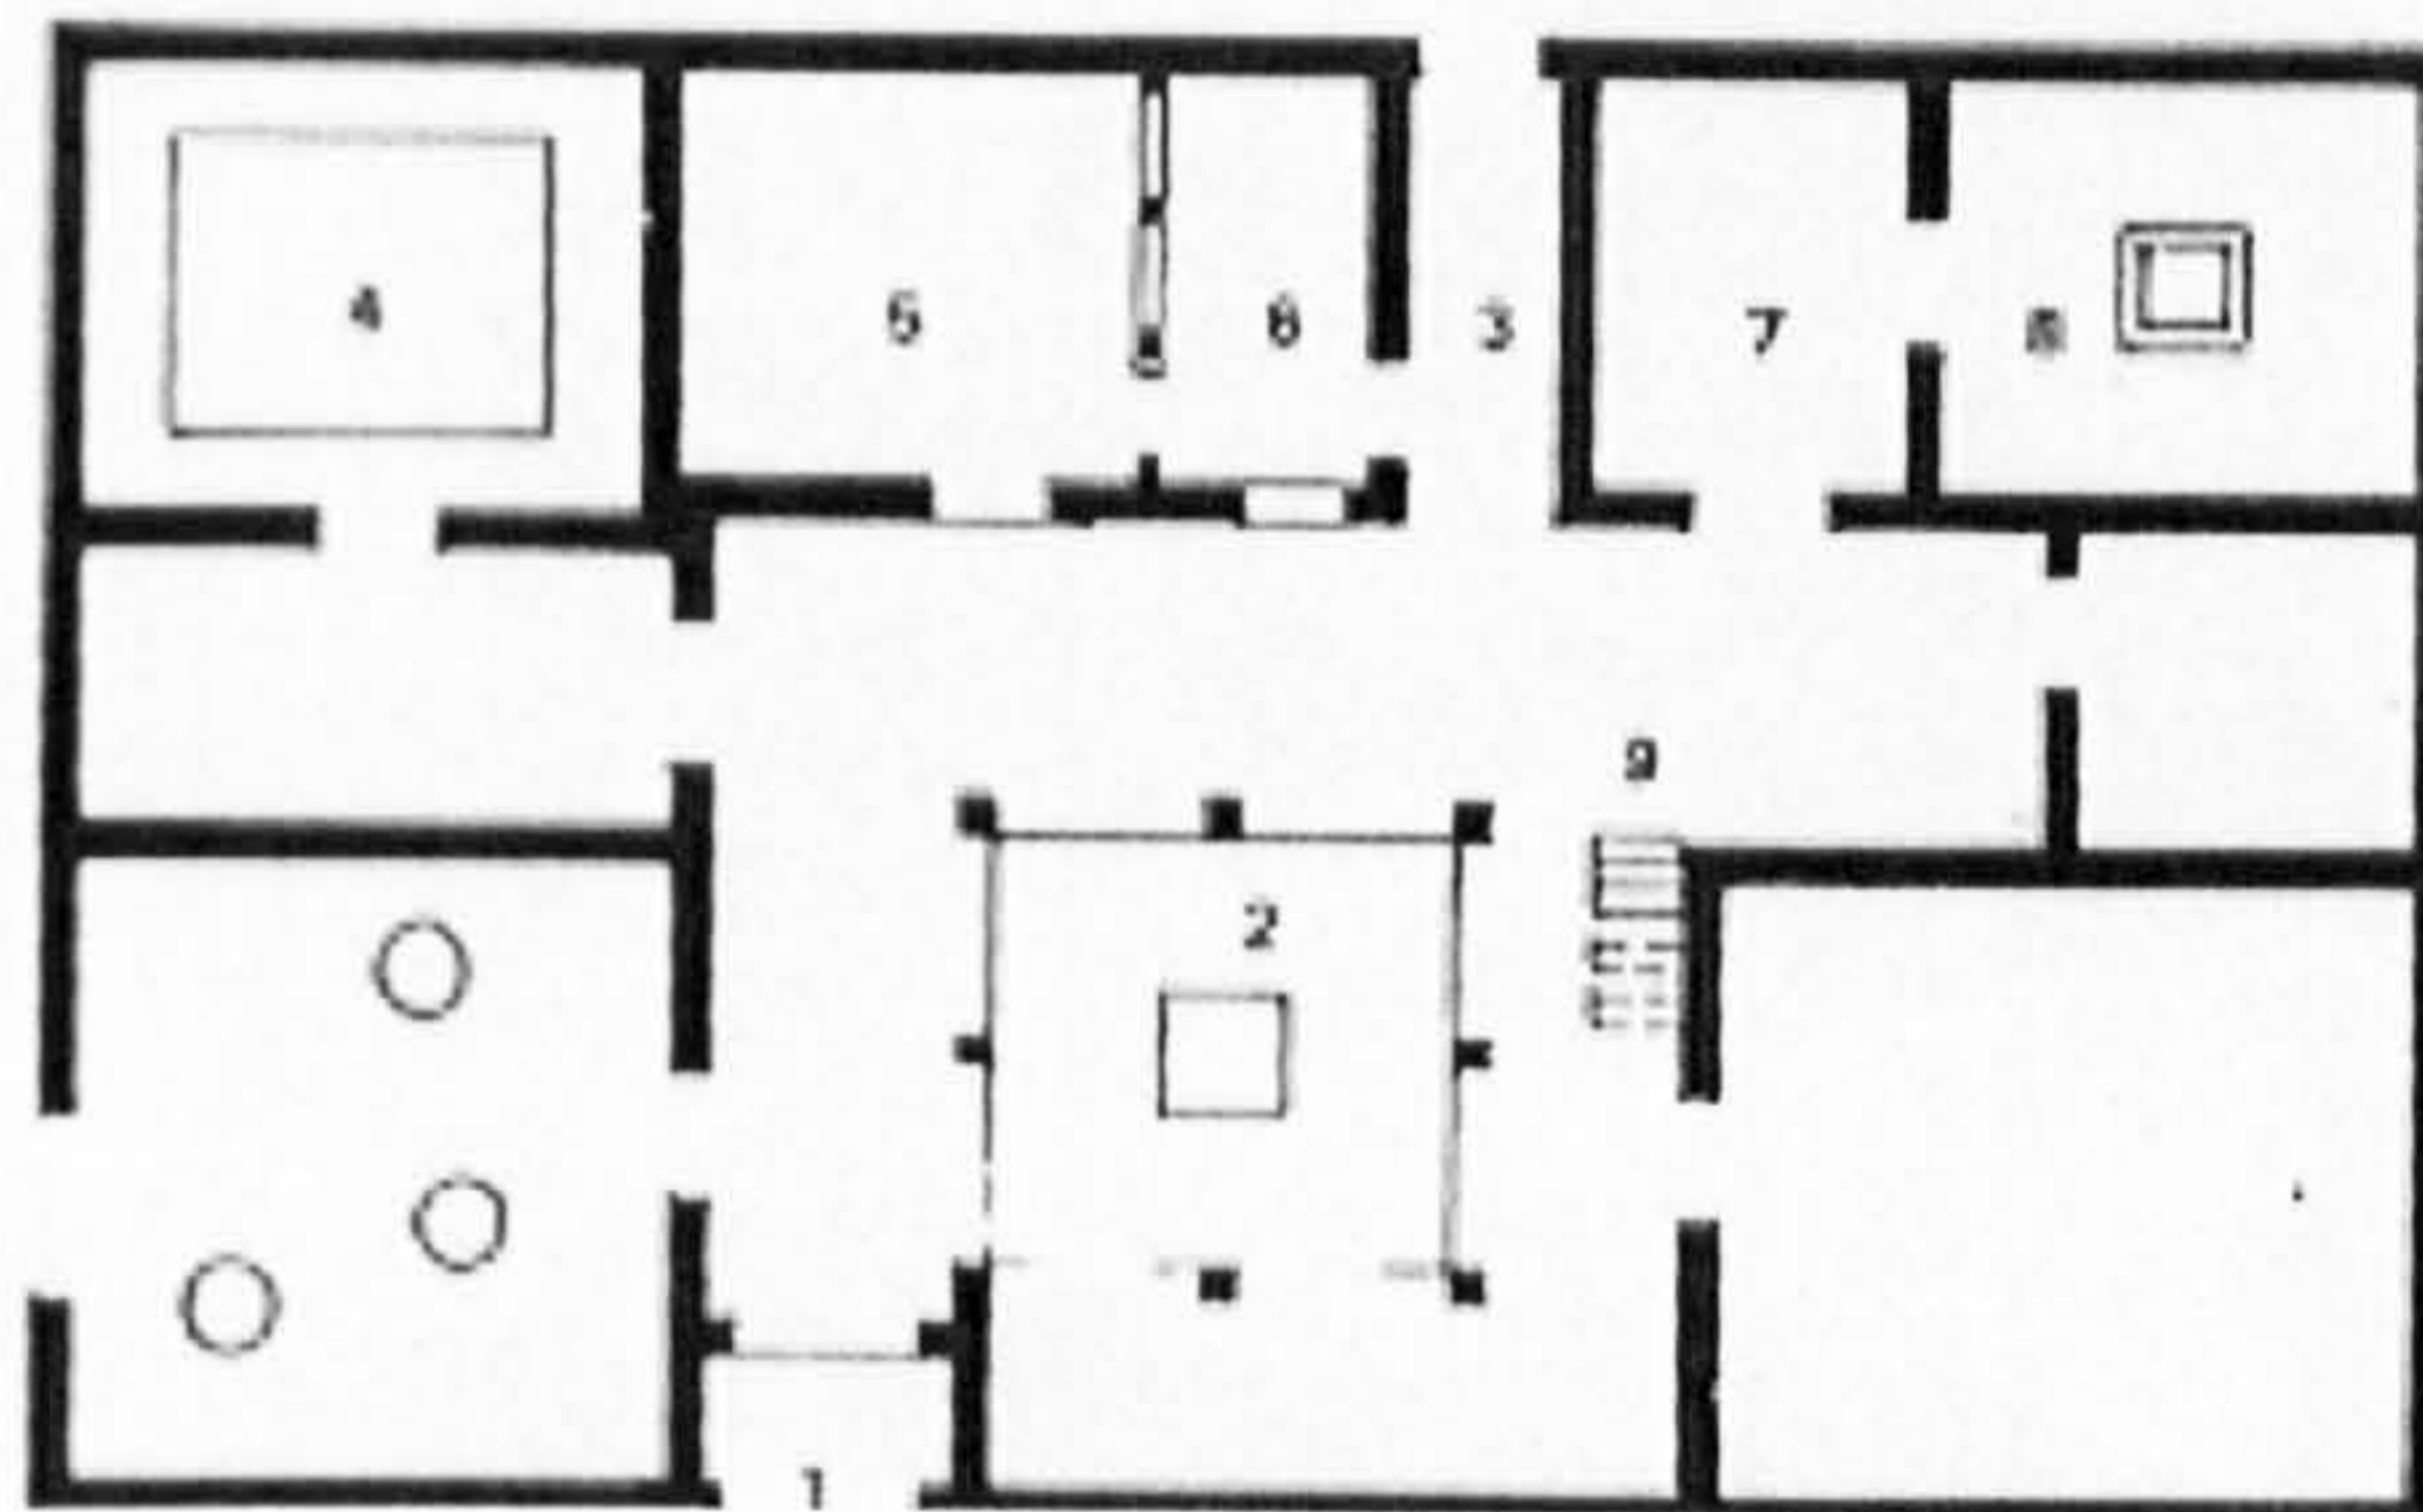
5 Site plan of the house in Olynthos [Bednar, 1986]
